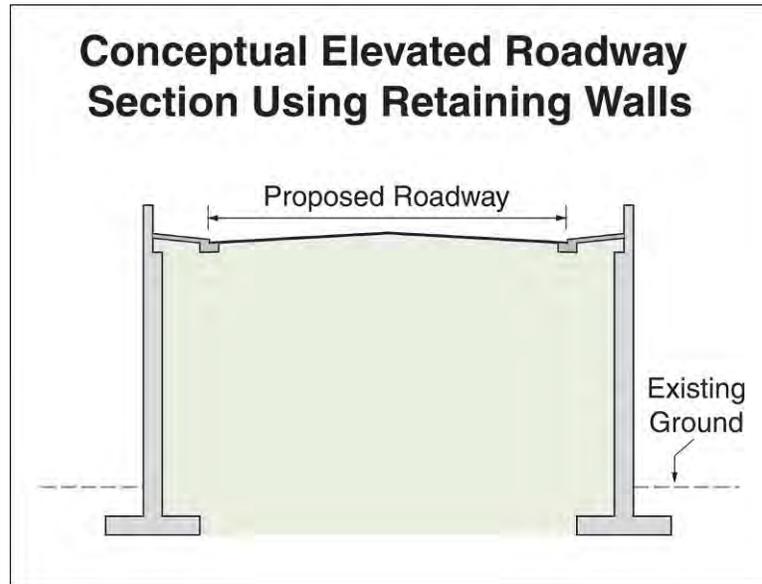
Conceptual Elevated Roadway Section Using Retaining Walls
